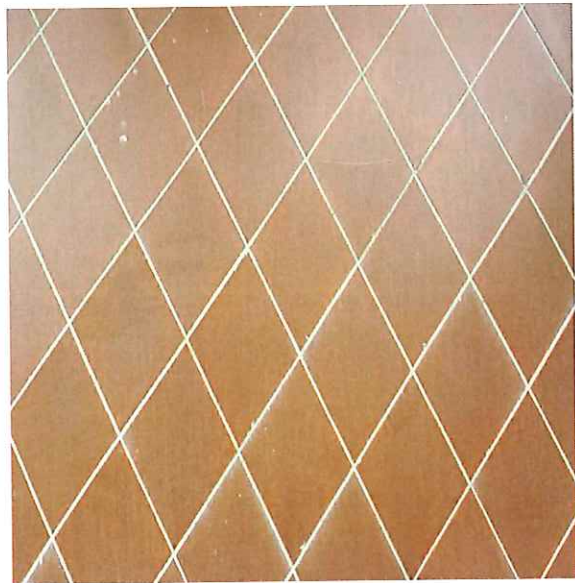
illustrating newly laid tiles as an indication that work was done recently to this area on the 3rd floor balcony located between the central elevator and the western stairwell.
